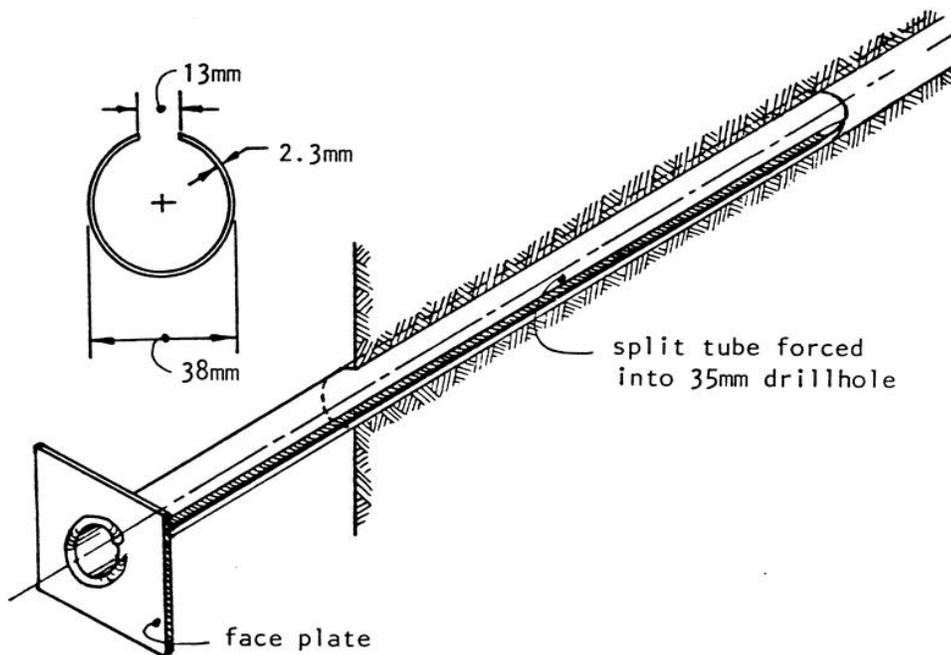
Split set untensioned rock reinforcement system used by the mining industry for temporary support duties.
